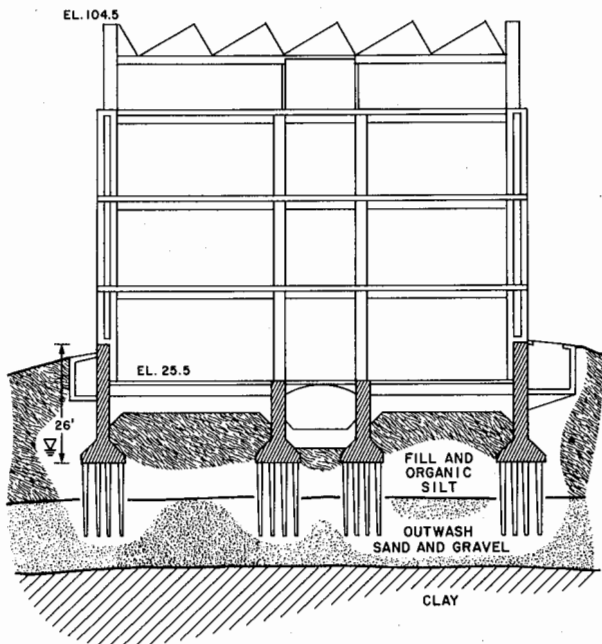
Cross section showing Freeman's proposed foundation. Cross hatching indicates longitudinal grade beams.
